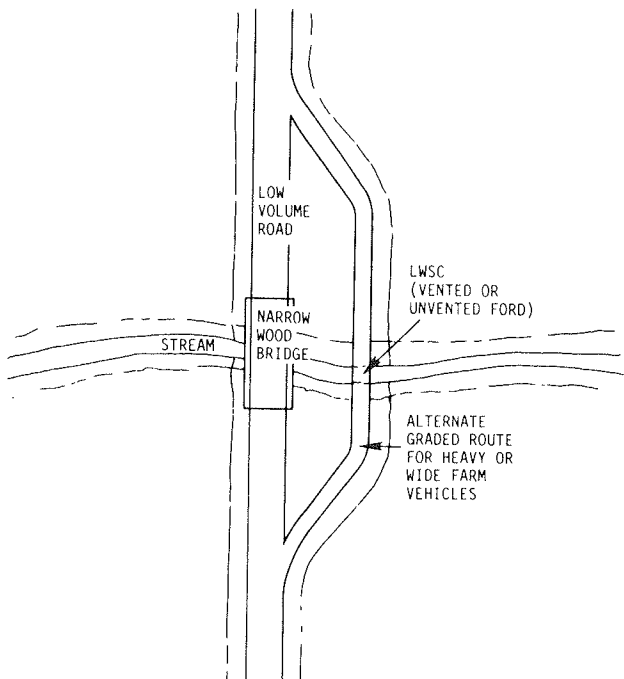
Combination obsolete bridge with alternate LWSC for farm equipment.
